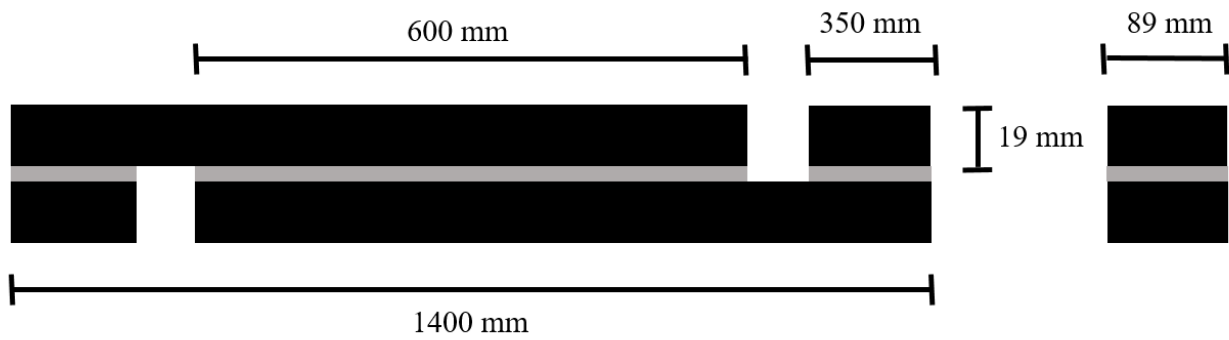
Single-lap shear sample dimensions. Length view (left). Width view (right).
